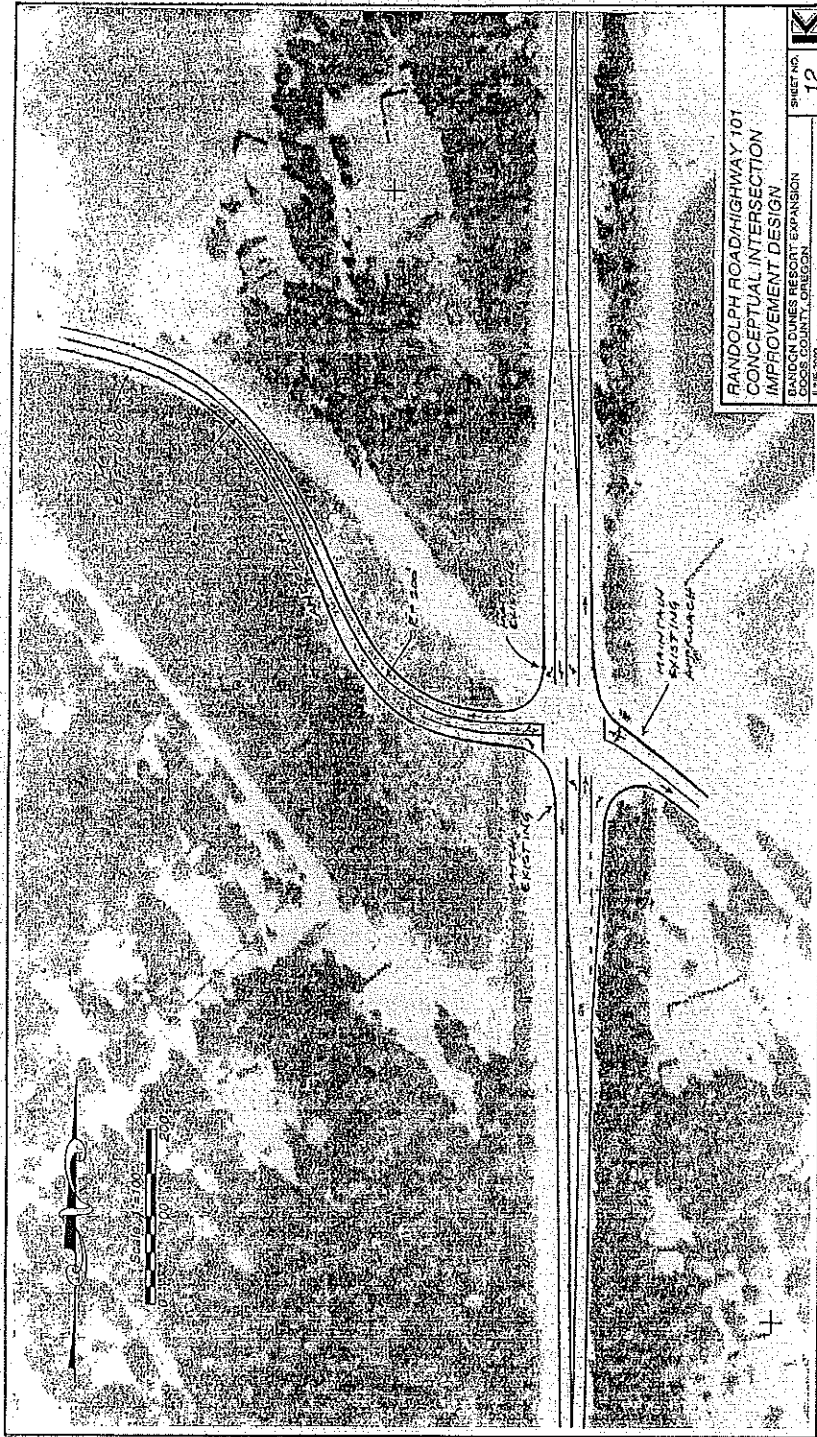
Randolph Road/Highway 101 Conceptual Intersection Improvement Design
